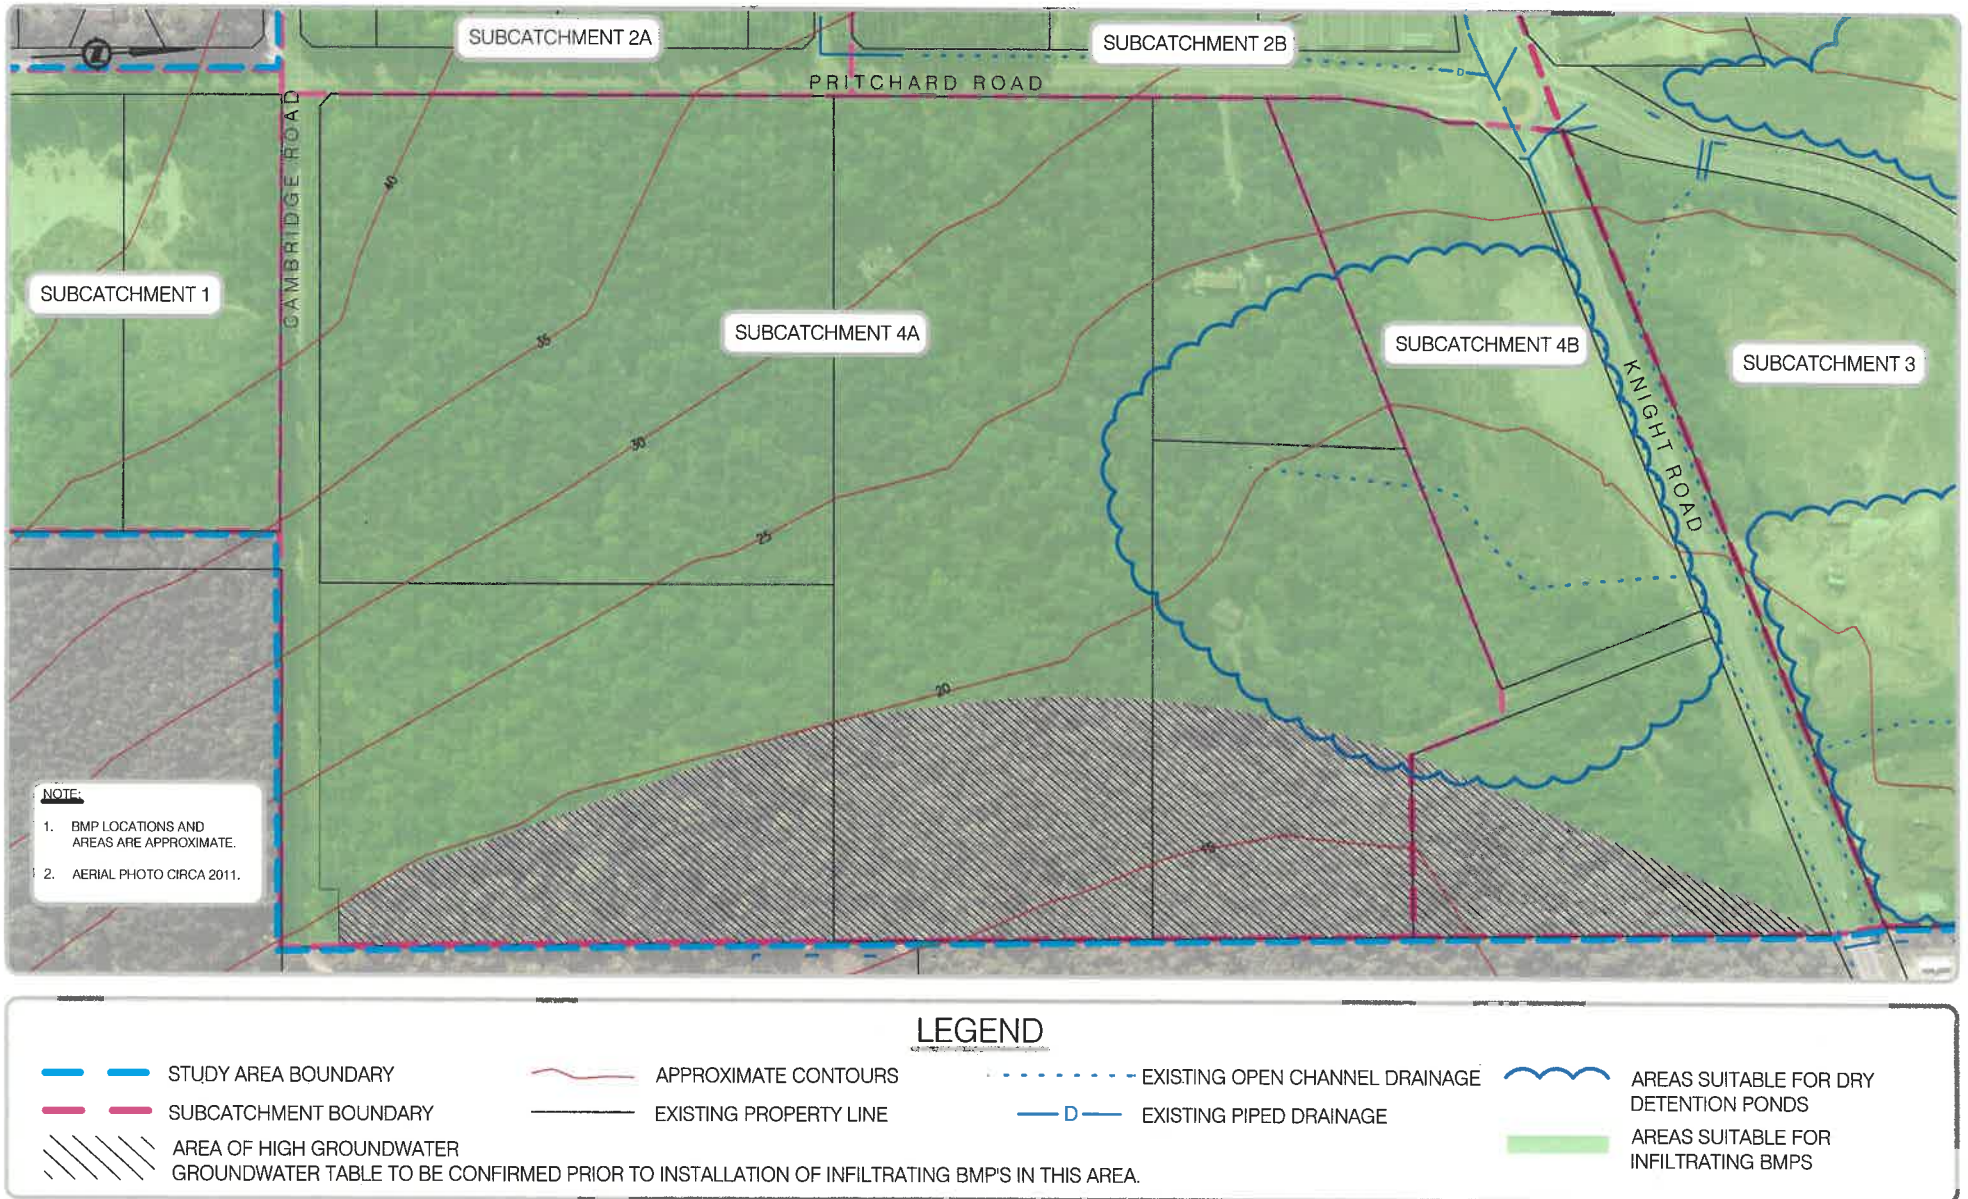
SUB-CATCHMENT 4 CONSTRUCTED BMP LOCATIONS
